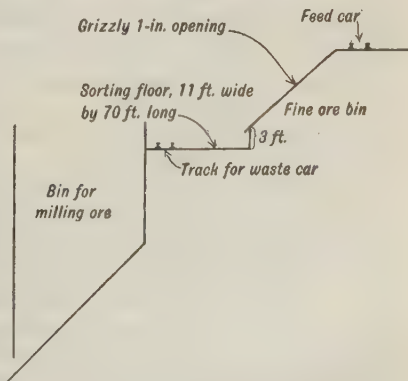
shows one arrangement. The floor was covered with $\frac{1}{2}$ -in. steel plate.
